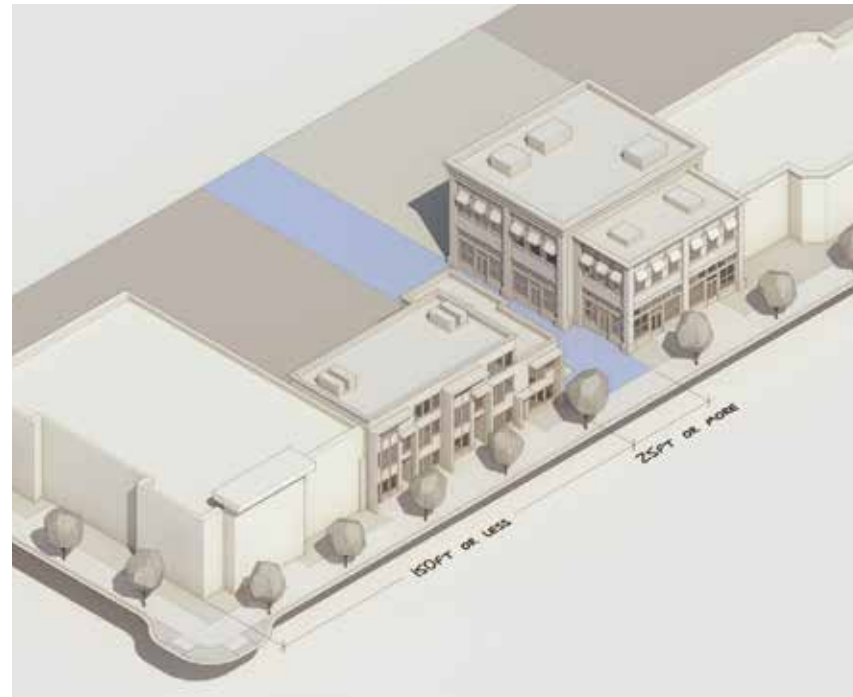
In the PAOZ-2 District, buildings shall break to ground level at least every 150 feet, and the distance between buildings should be no less than 25 feet wide (see D at left).
